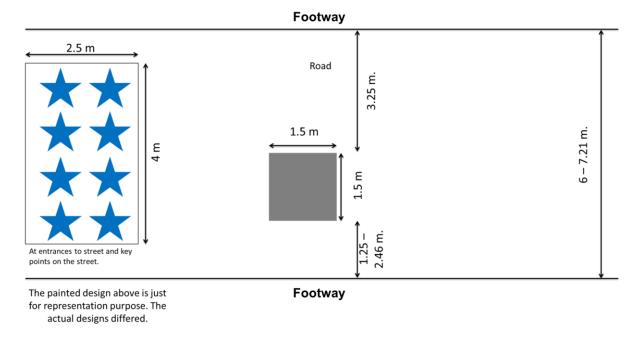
Whitehall Avenue – Design of Community Corner, Carriageway details
